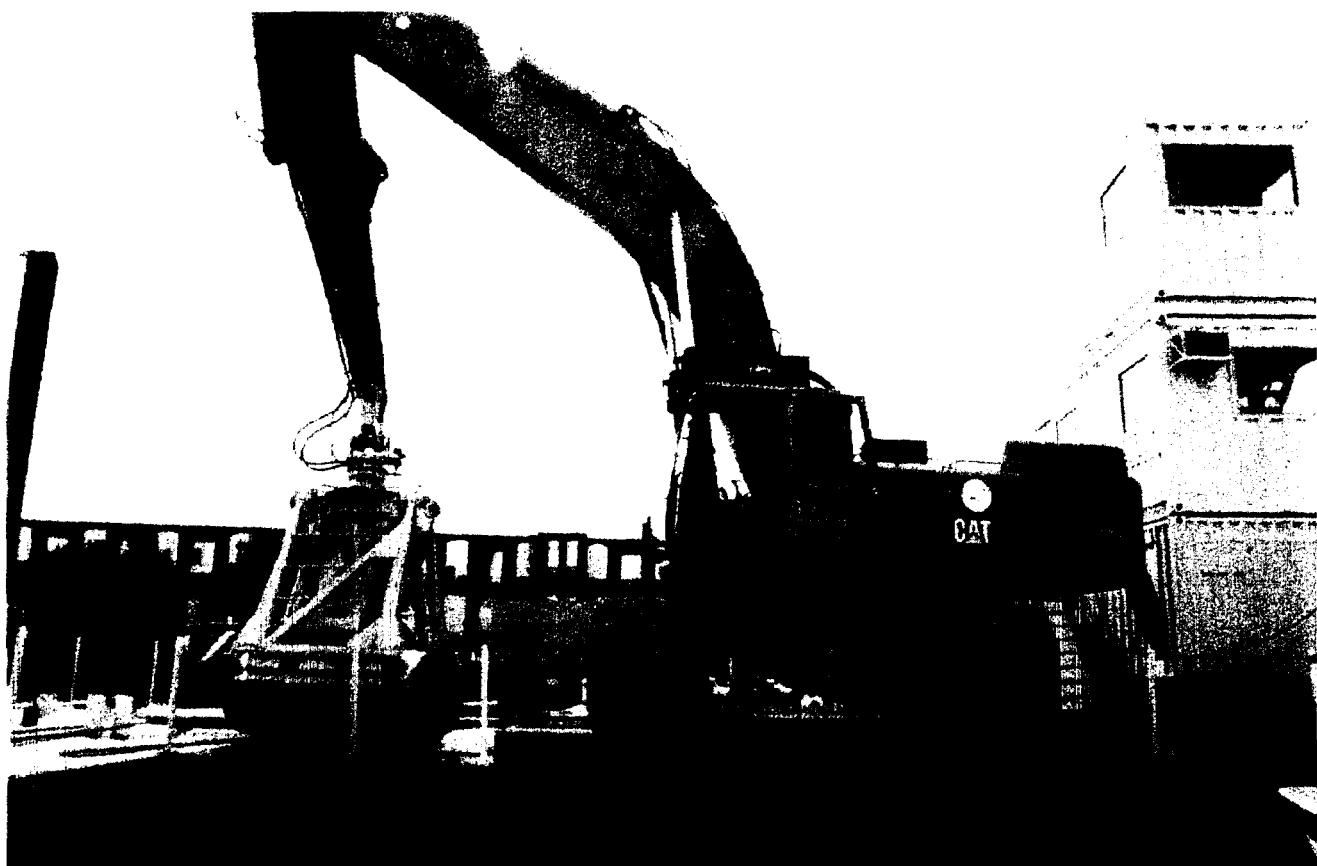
CATERPILLAR 375LC HYDRAULIC EXCAVATOR WITH 4.5 cy HORIZONTAL PROFILING GRAB BUCKET
